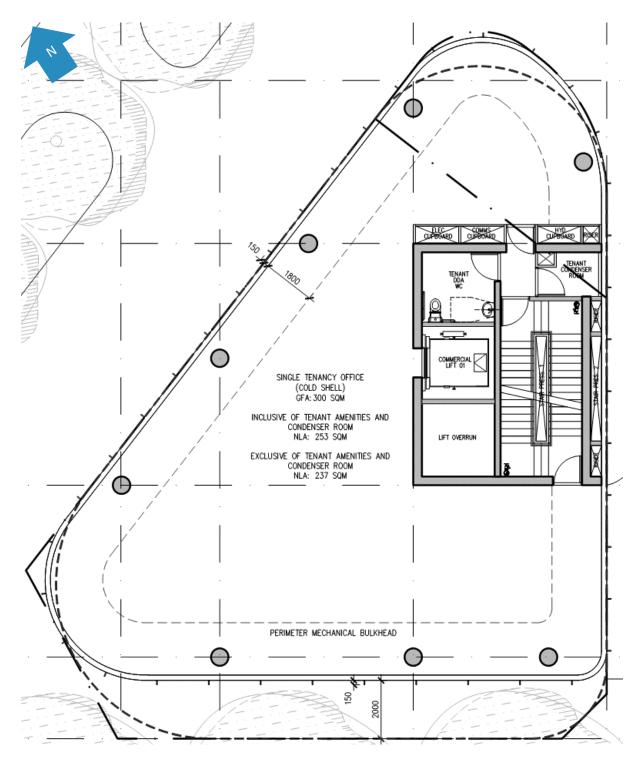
Proposed Floor Plans – Level 11 (Image Source: Elenberg Fraser)
